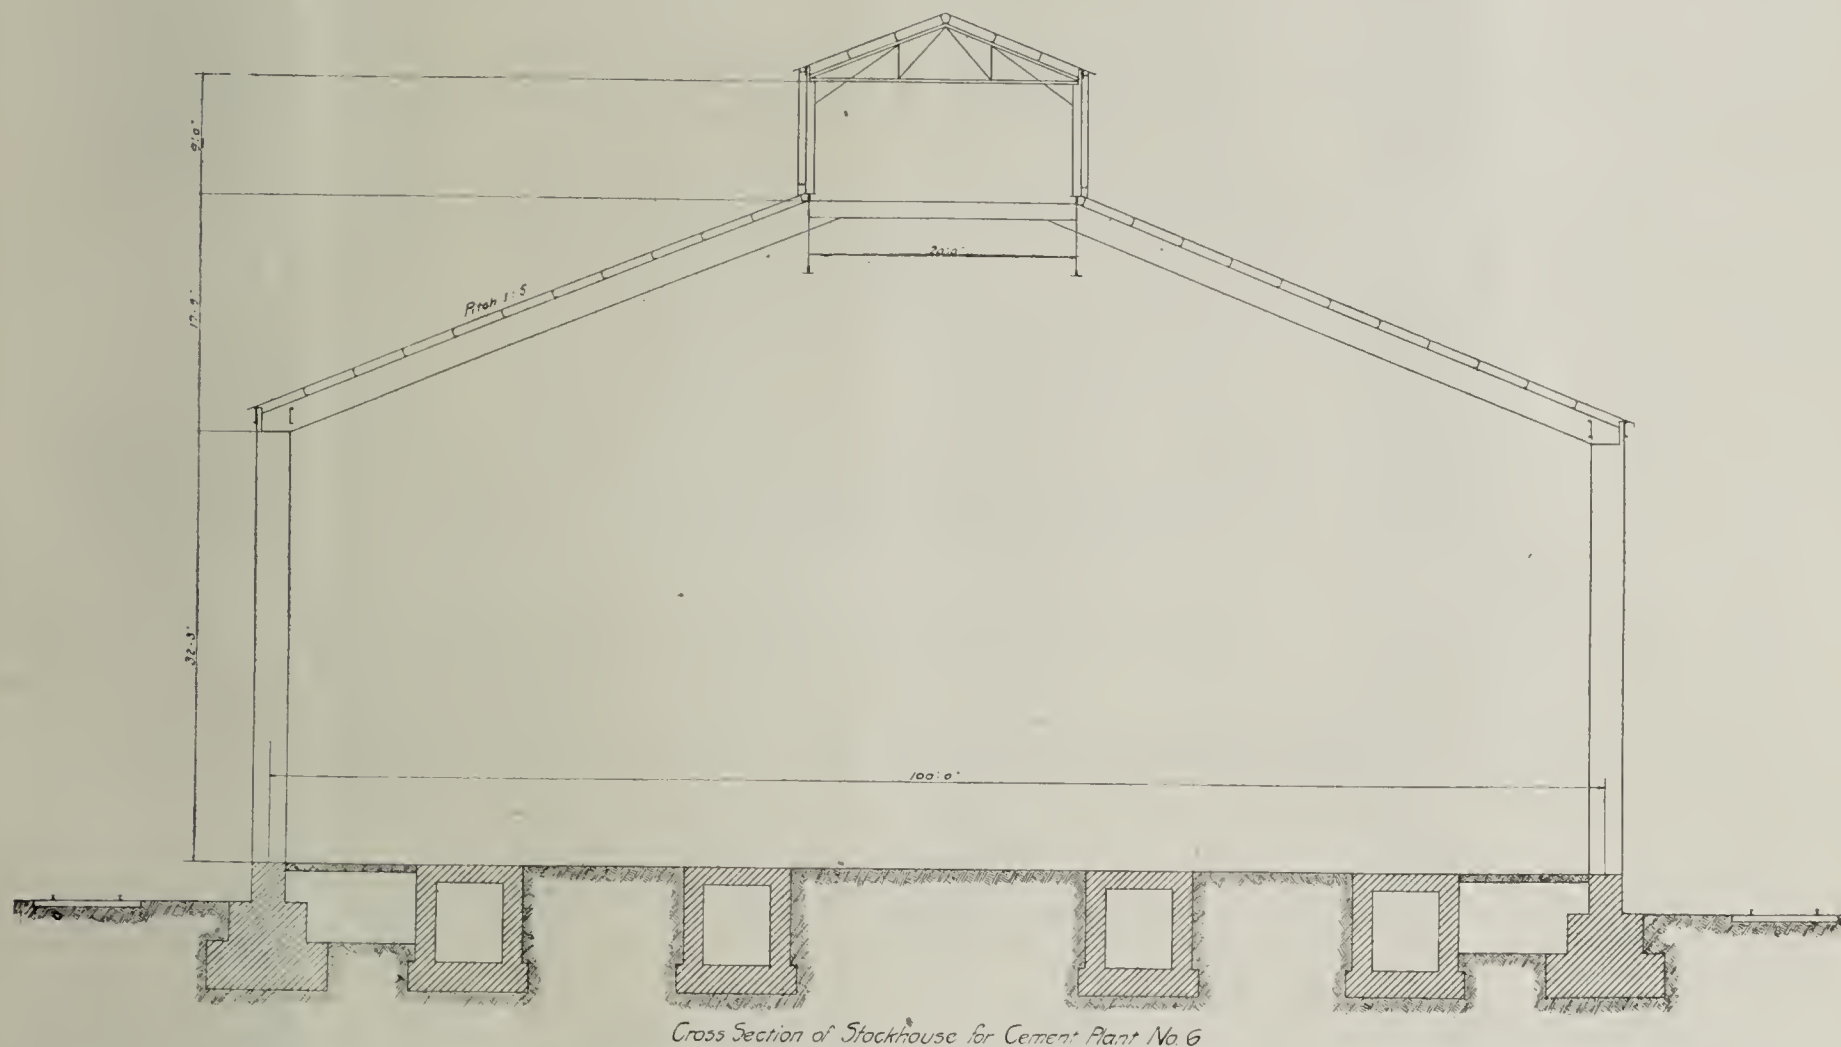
Stock House for Cement Plant No. 6, Buffington, Ind. Reinforced Concrete Side Walls With Steel Columns.
